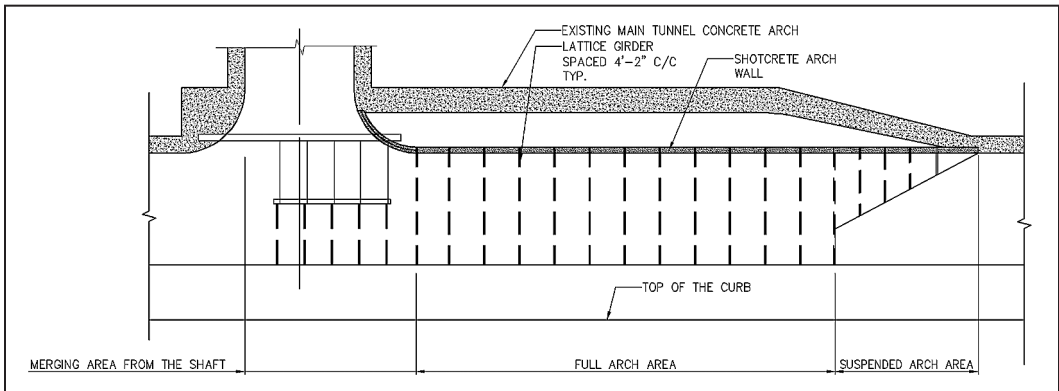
Tunnel ventilation arch wall section—longitudinal section
